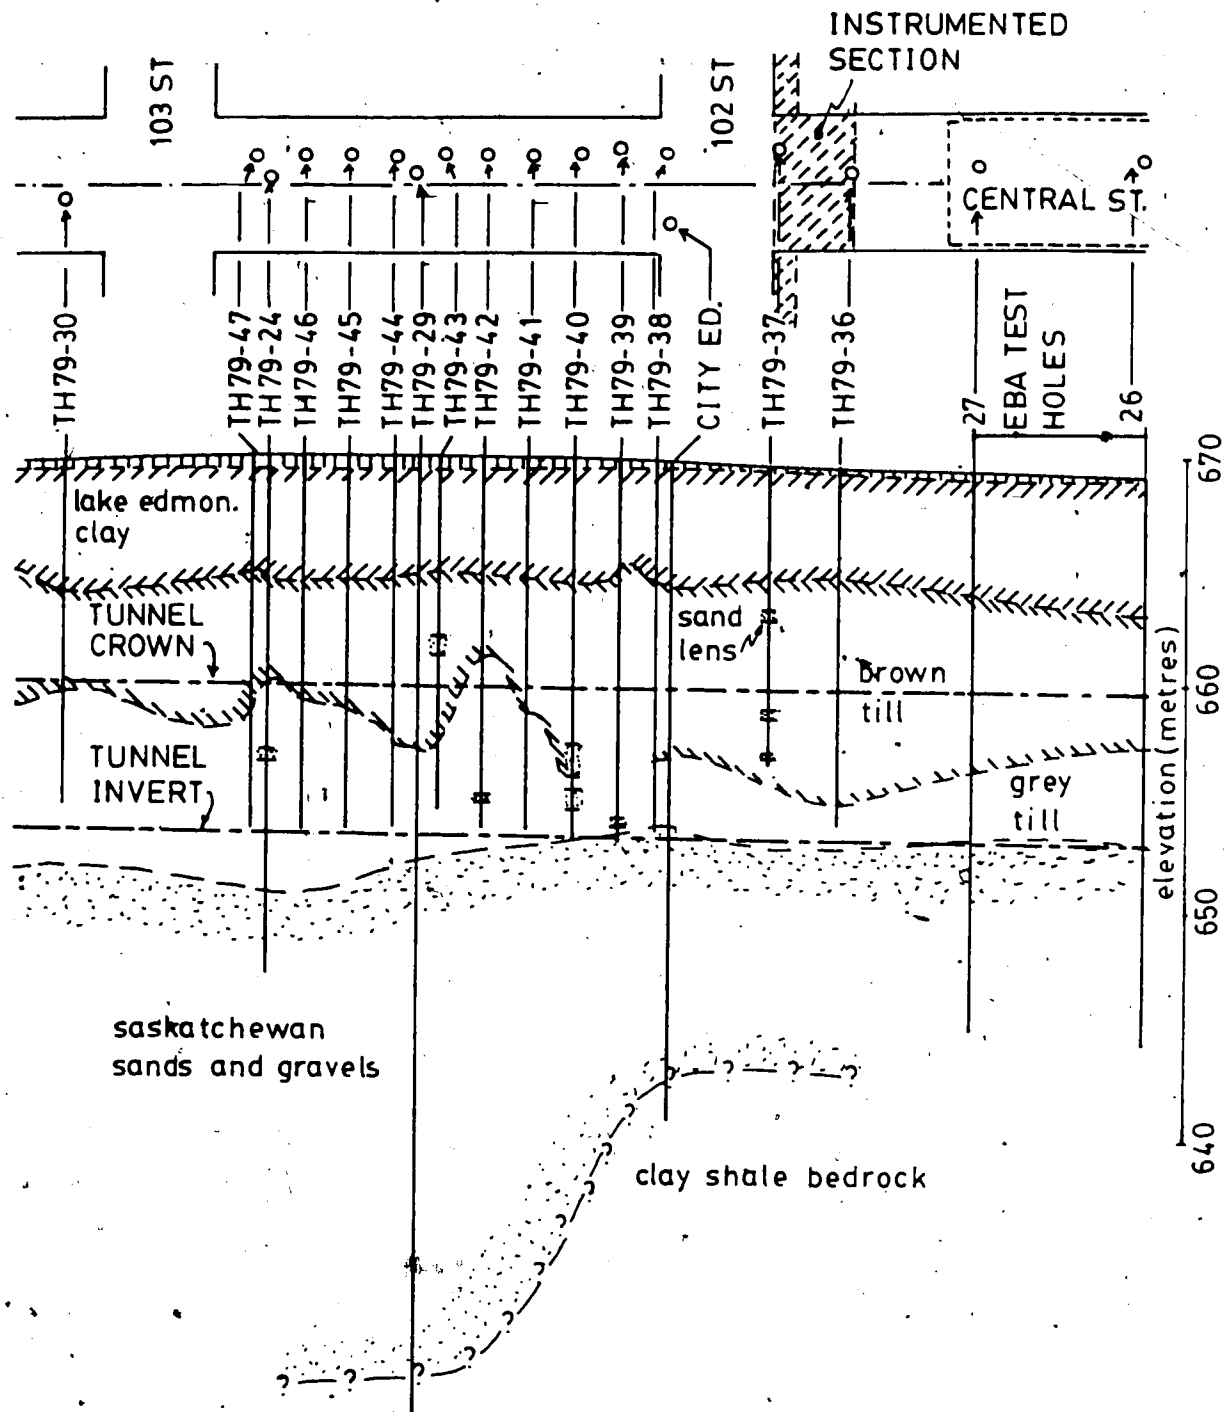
PLAN AND PROFILE FROM CENTRAL STATION TO 103 STREET (AFTER THURBER, 1980)
